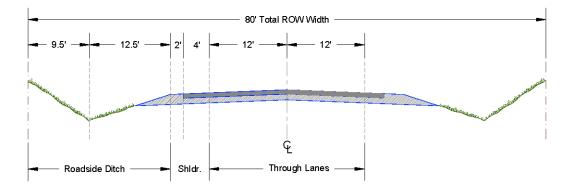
Rural Collector Street Cross Section – El Paso County ECM Standards
